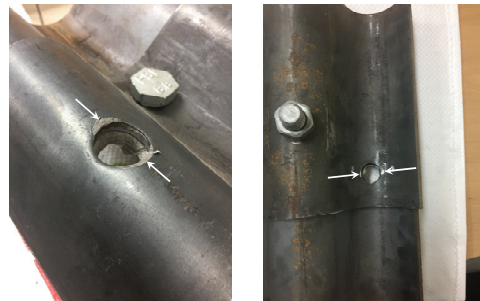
Local Damage of Corrugated Steel Plate in Contact Surface during Fastening of Bolt and Nut
